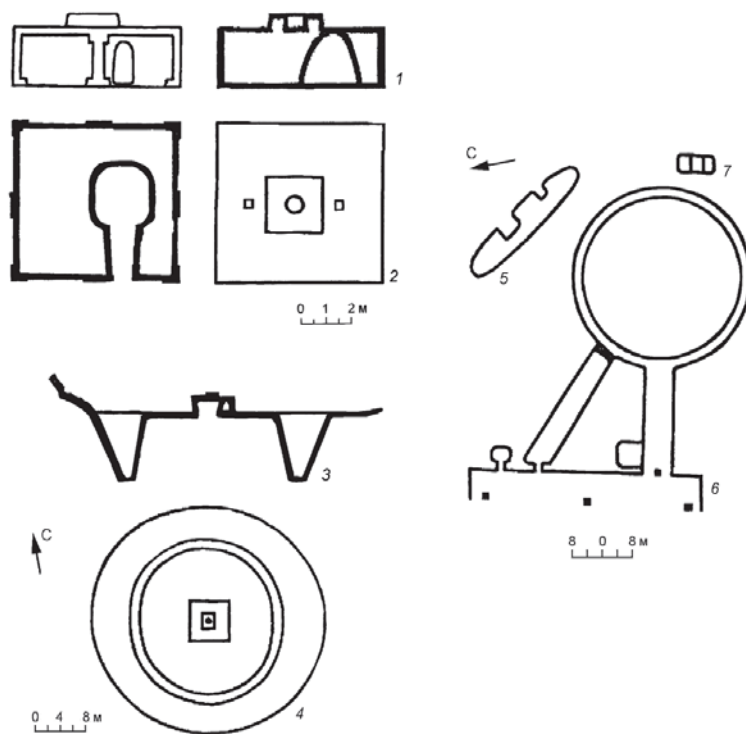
Fire altar in Samangan: 1-2 – plan and section; 3-4 –general plan; 5-7 – cave places to the north from the altar; 6–plan of ayvan and altar-related premises, a corridor around the foundation.
